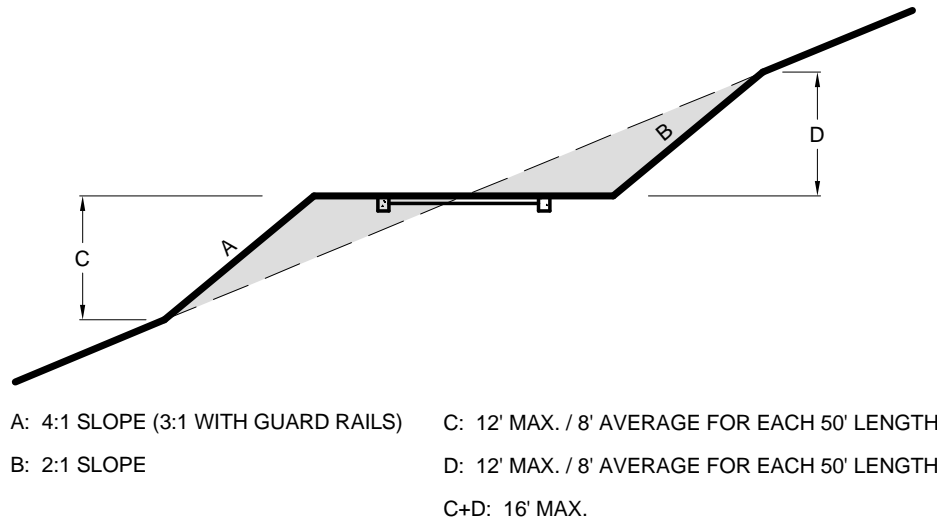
HILLSIDE LANDFORM ROAD CUTS
